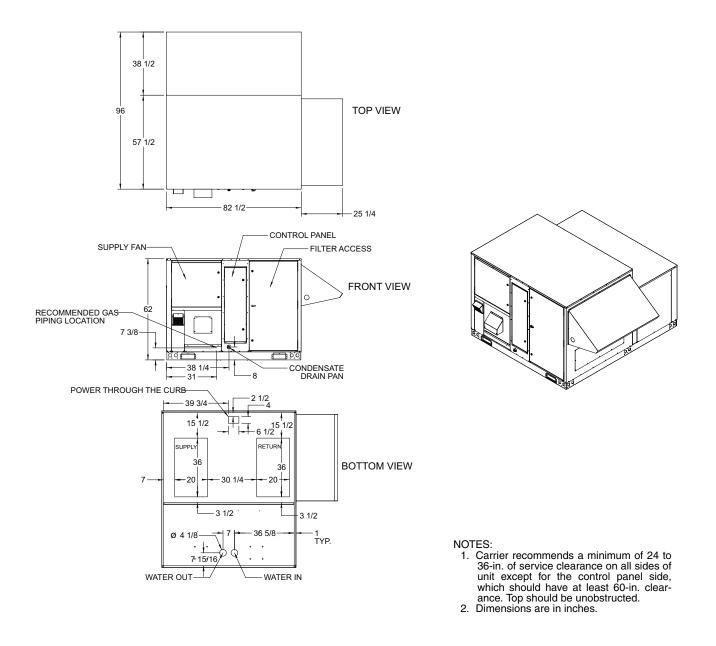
Unit Dimensions — 62RA,RB12-20 Standard Units
